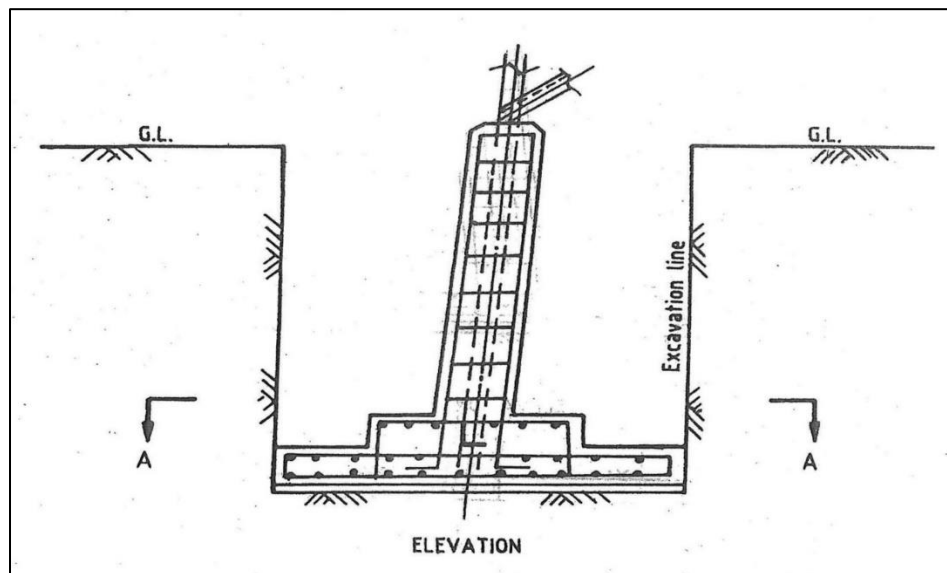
(b): Reinforced Concrete Foundation without working clearance
